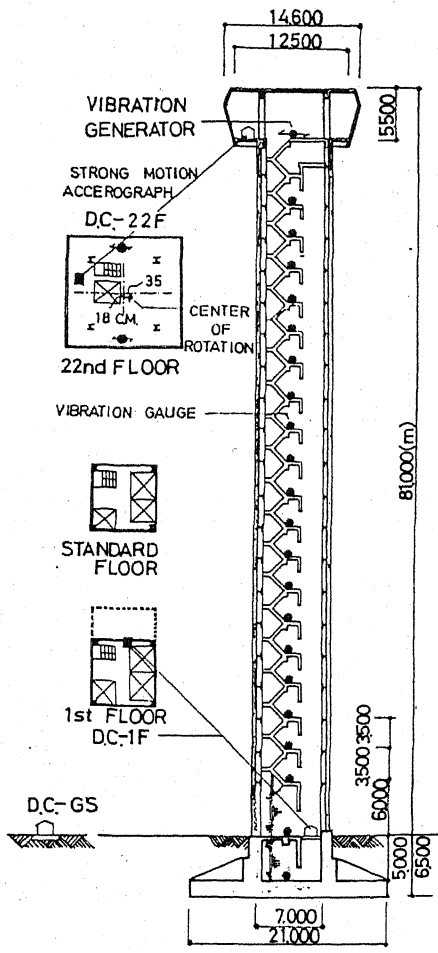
SECTION AND PLAN OF ELEVATOR TOWER
